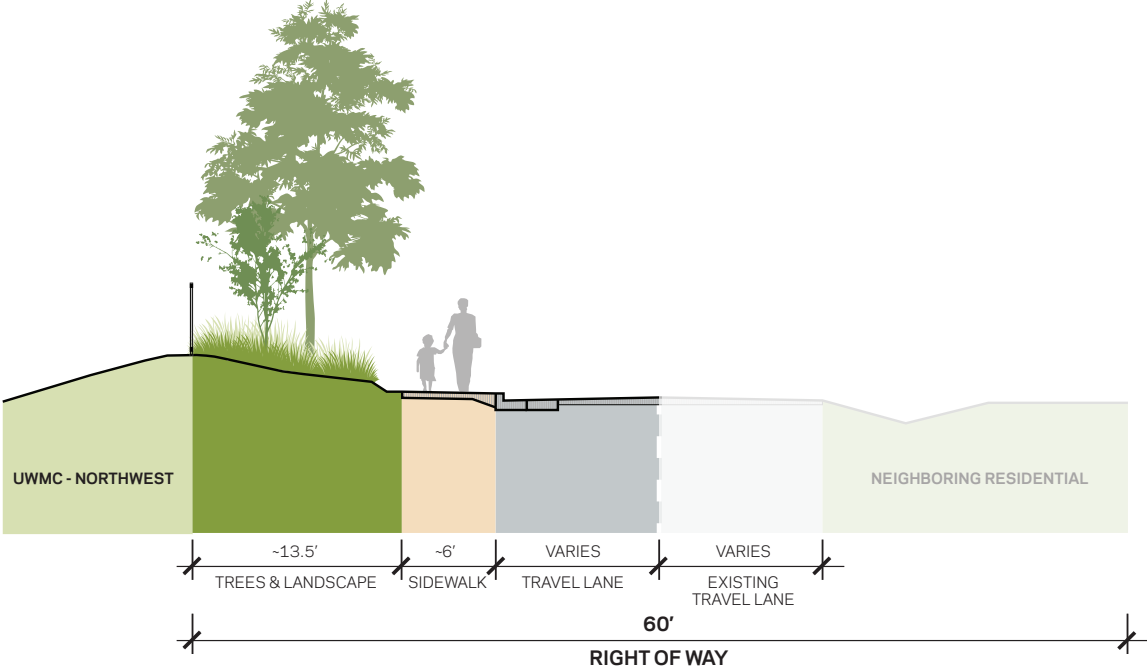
STREET SECTION AT N 120TH ST - NORTHWEST CAMPUS EDGE
